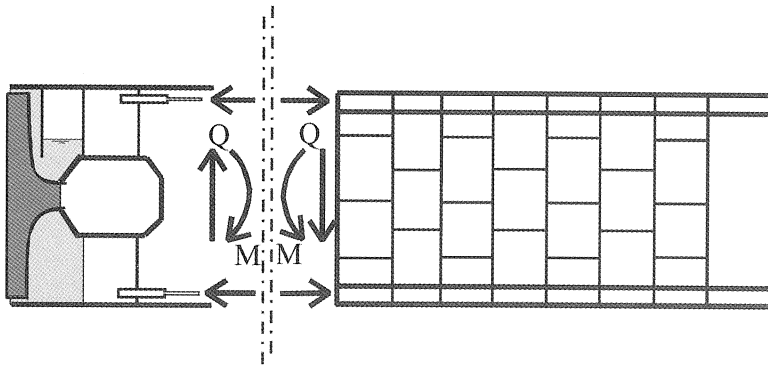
Loading of the tunnel beam by the tunnel-boring machine.
